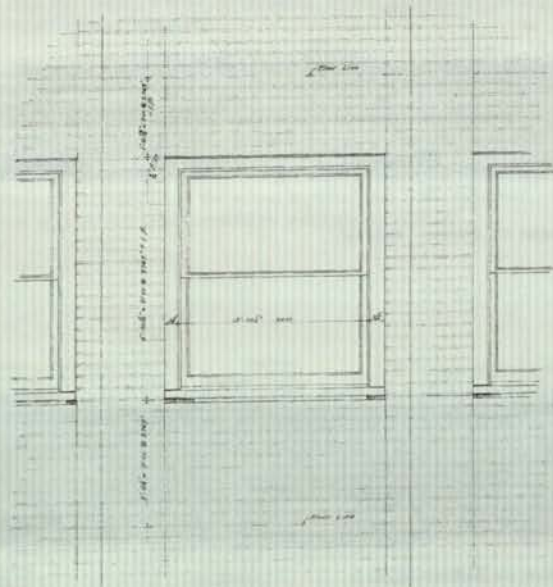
West wall elevation detail (PS&H/AA Drawg.#204 3/9/48)
